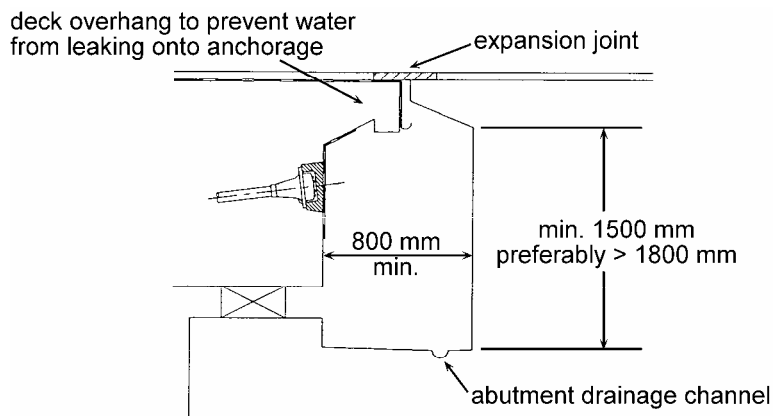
Member End Details for Anchorage Corrosion Protection²²
